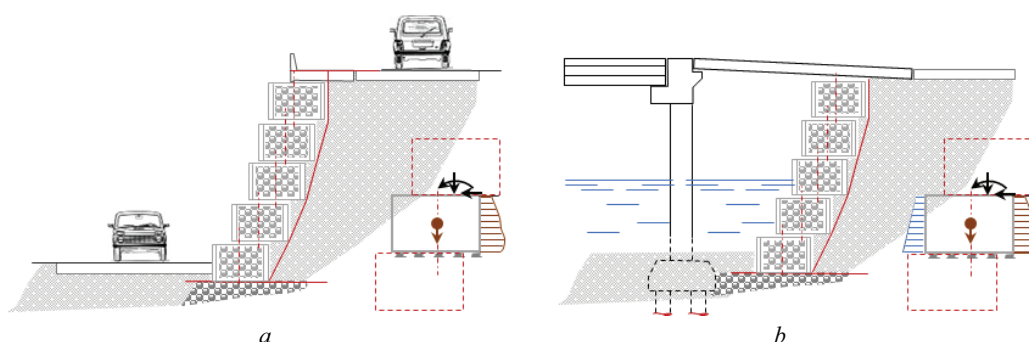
Section diagrams and fragments of calculation schemes of retaining structures made of blocks filled with crushed stone in transport construction: *a* — retaining wall of road embankment; *b* — bridge crossing slope
